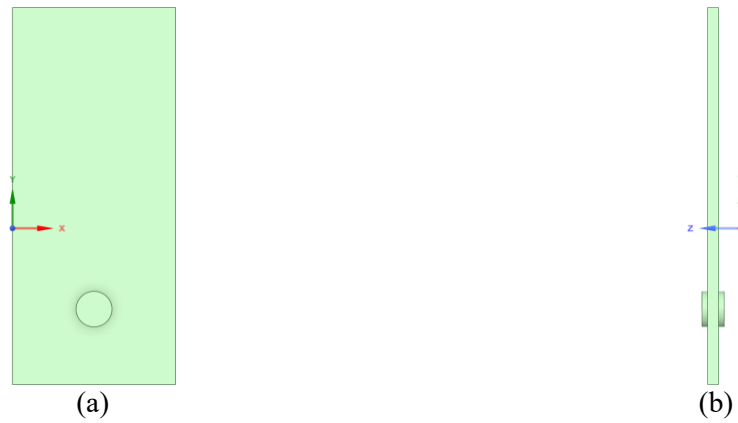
Simplified model showing a single inner plate with a cylindrical bolt shank inserted through the hole; (a) front and (b) side view.
